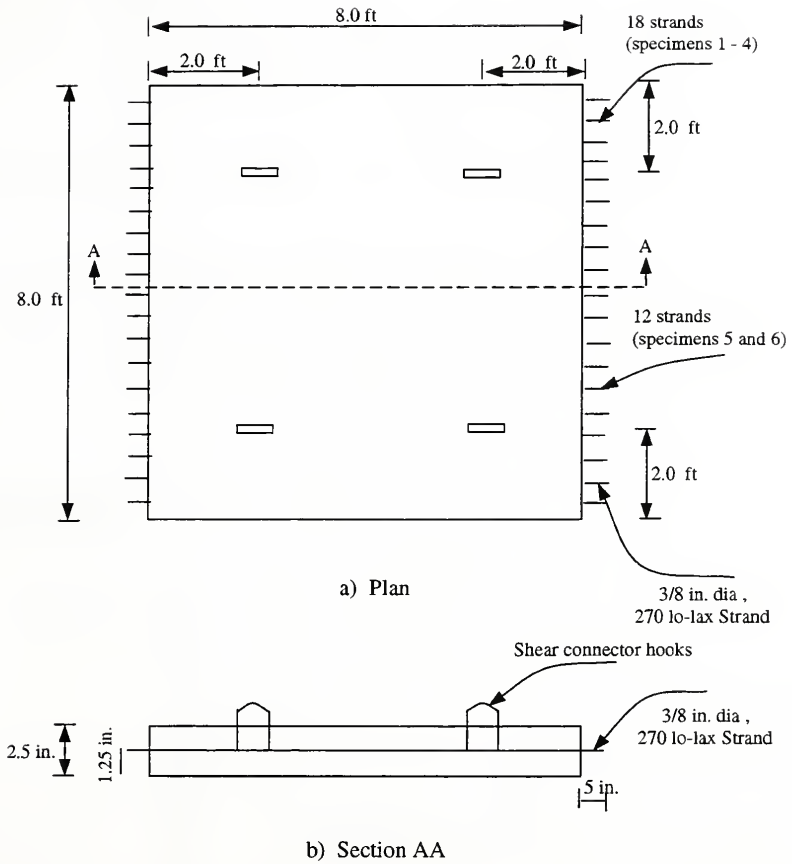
Typical detail of a panel with 4 stirrups a) Plan b) Section AA
